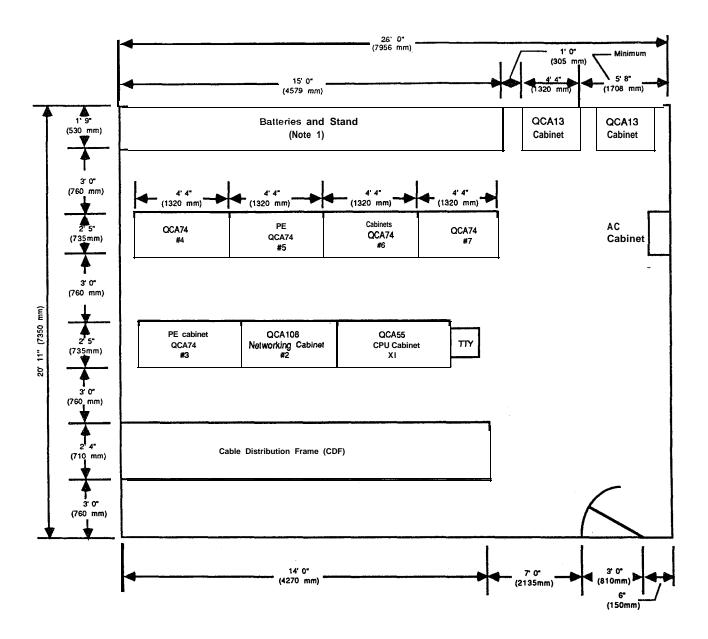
TYPICAL MERIDIAN SL-1XT FLOOR PLAN
